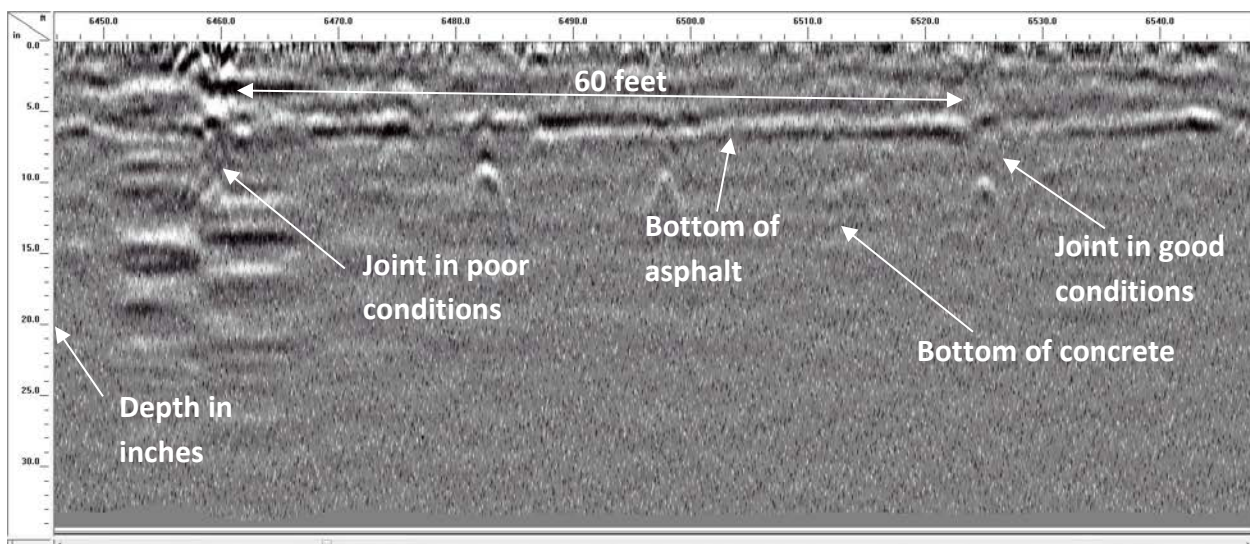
GPR image from HUR-20.76 pavement showing the conditions of two joints spaced 60 feet
